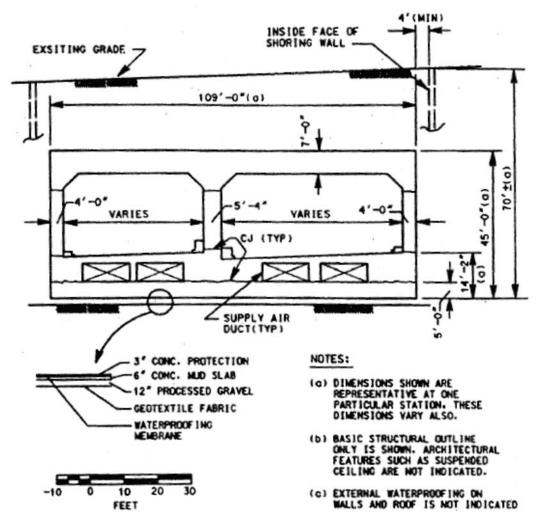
Cut-and-cover tunnel, subsurface highway structure.
